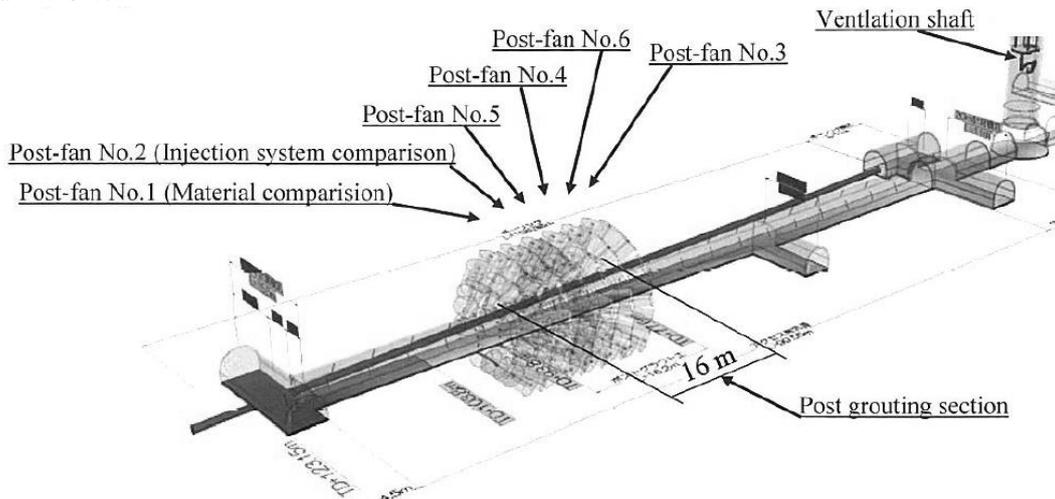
Schematic layout of post-excavation grouting fans⁶⁾
